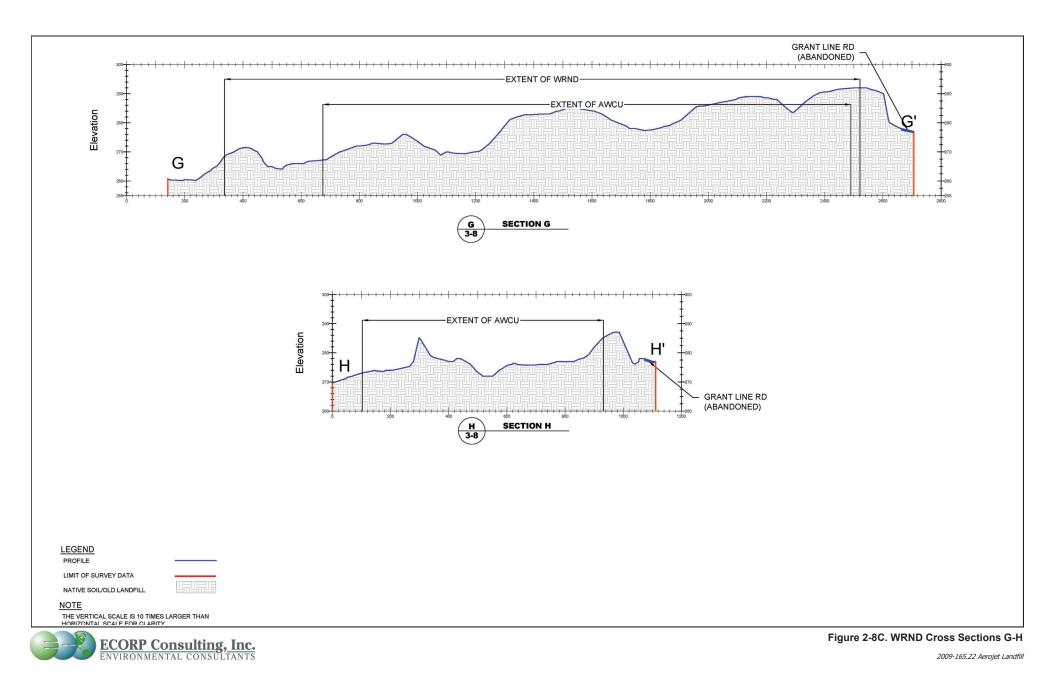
WRND Surface Elevation Map and Cross Sections
